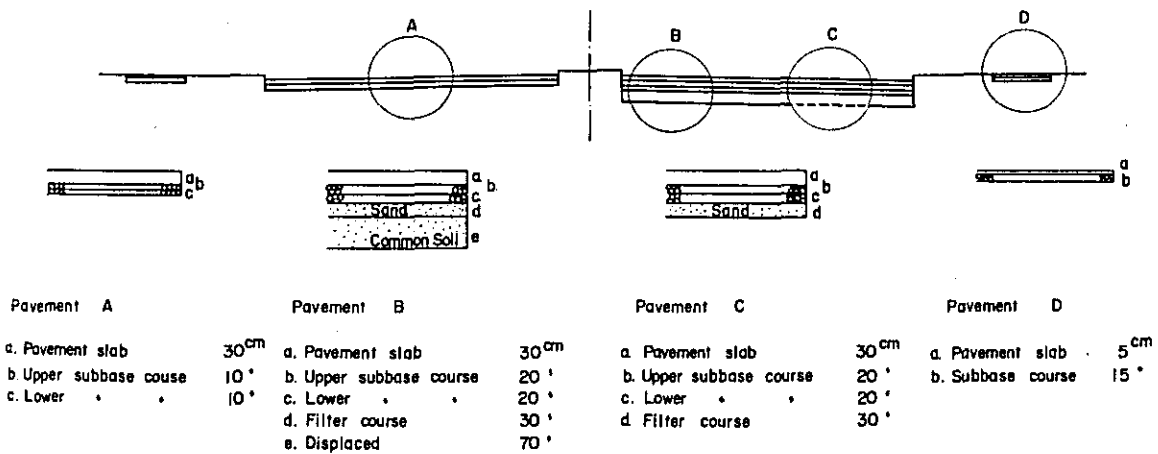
STANDARD THICKNESS OF PAVEMENT
